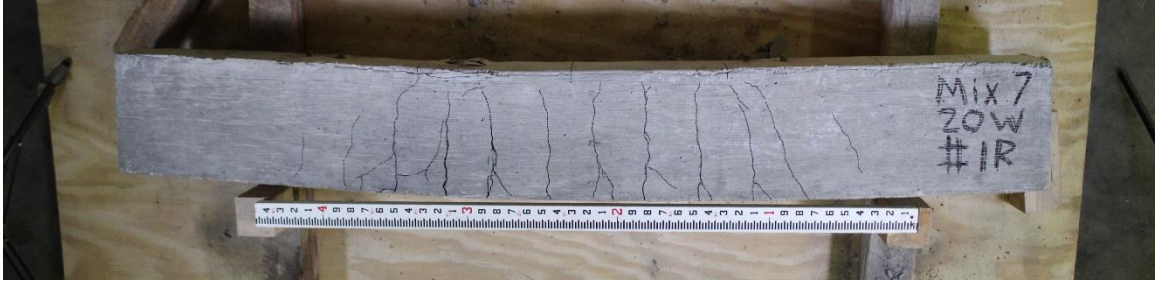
Mixture 7 (20W) beam #1R: concrete beam side view.
